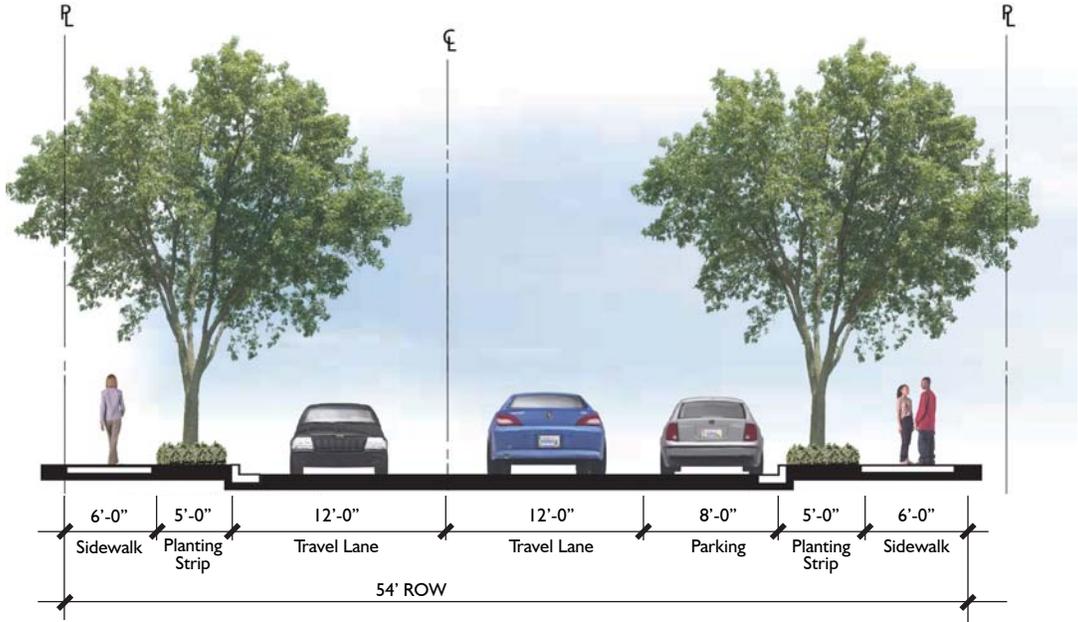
Internal Local Street for 5-11 Residential Units per Acre. Parking on one side (Minimum Allowable)
